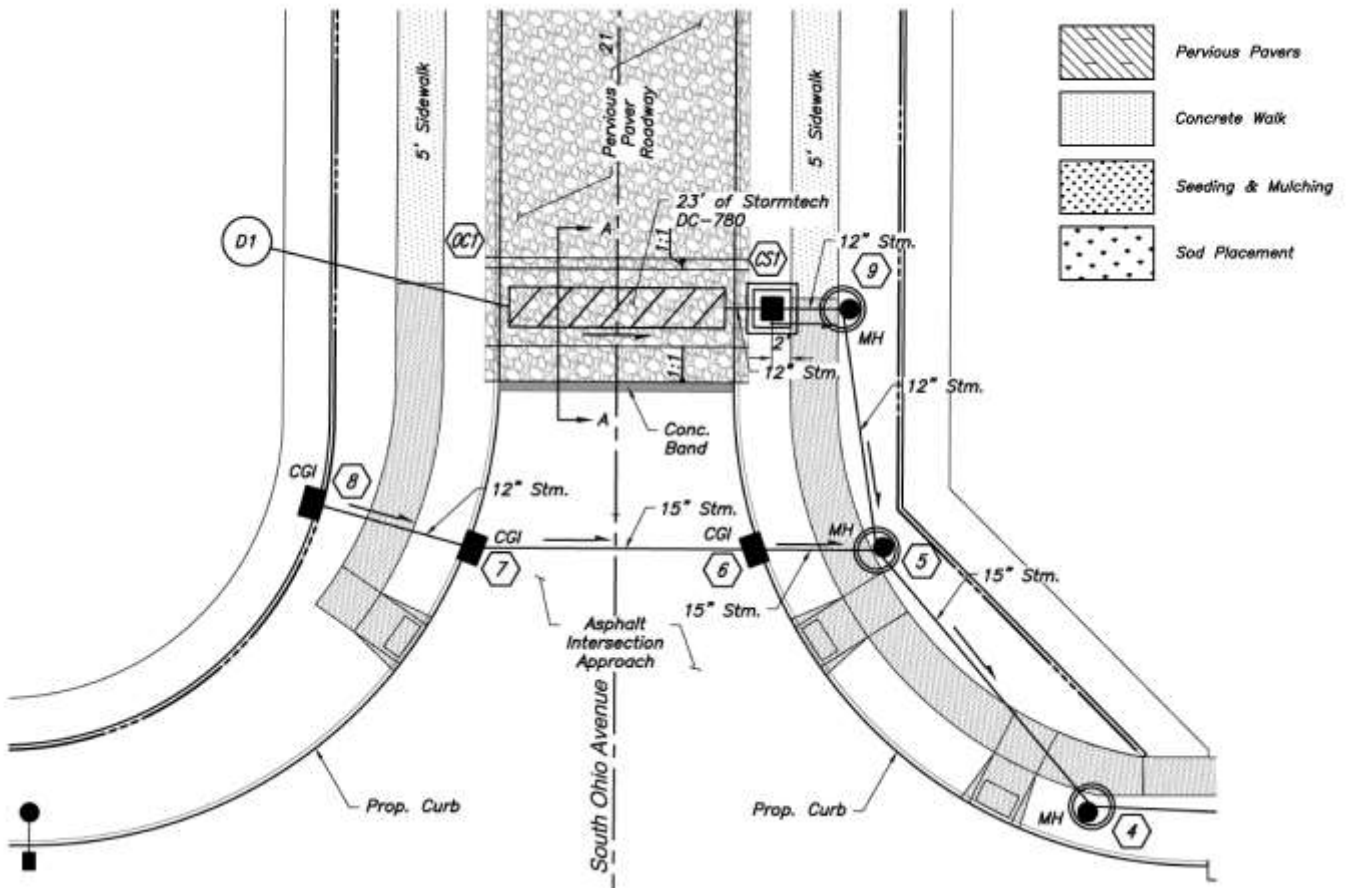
Plan view of Tech South permeable pavement with detention and outlet structure
